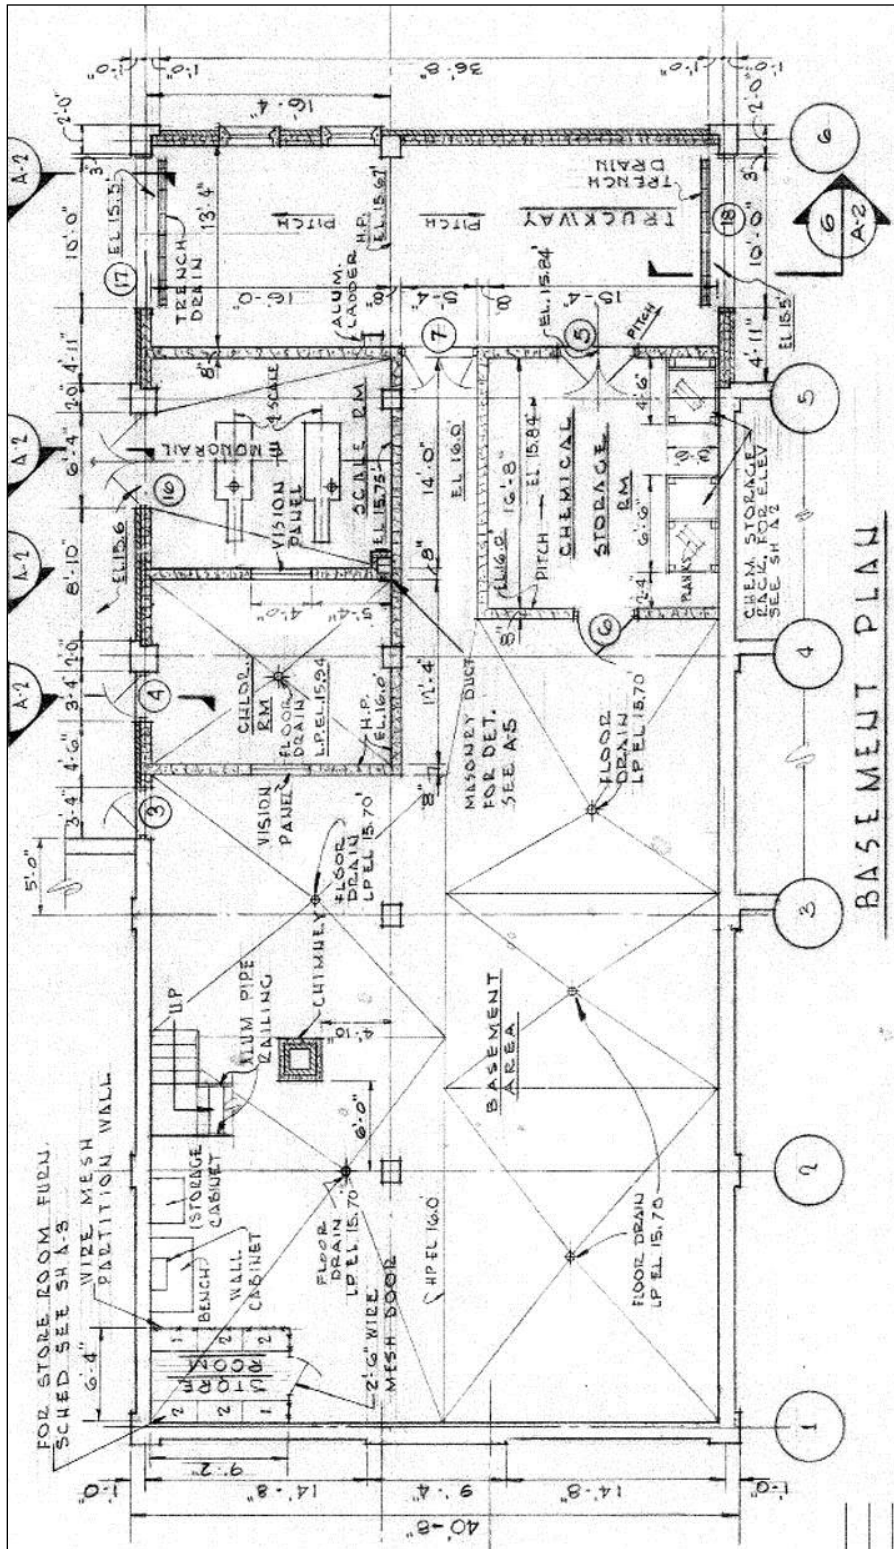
Record drawing of Basement Plan of Operations Building built 1965, converted to present Sludge Processing Building in 1993. Clip from sheet A-2, Operations Building, Plans and Elevations (Metcalf & Eddy, 1963).
